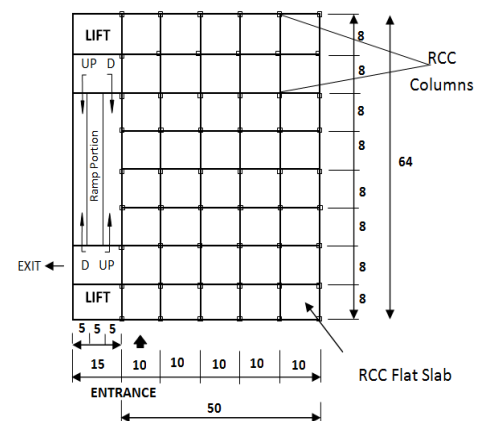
Typical Plan of RCC Flat Slab Floor Structure
